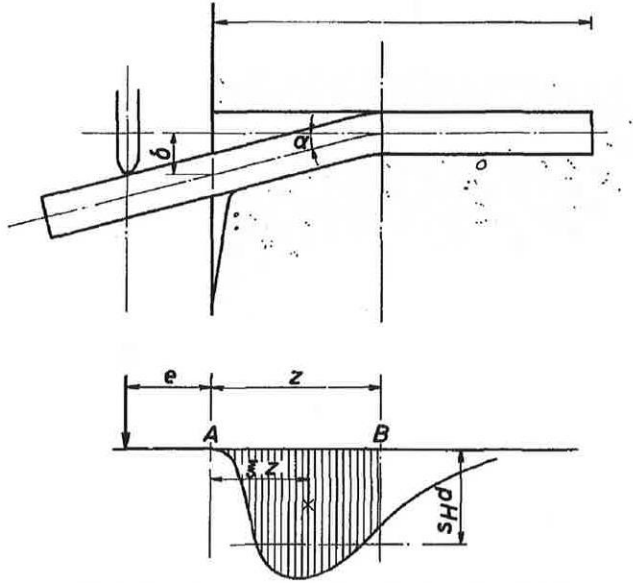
Dowel deformation and loading at failure, Rasmussen [Ra1963]
